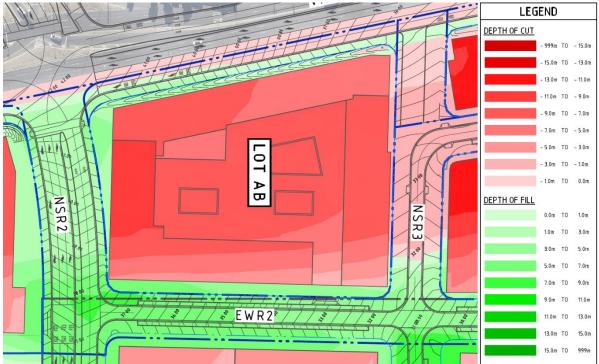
Proposed earthworks cut and fill diagram for Stage 4 (listed here as 'Lot AB').
